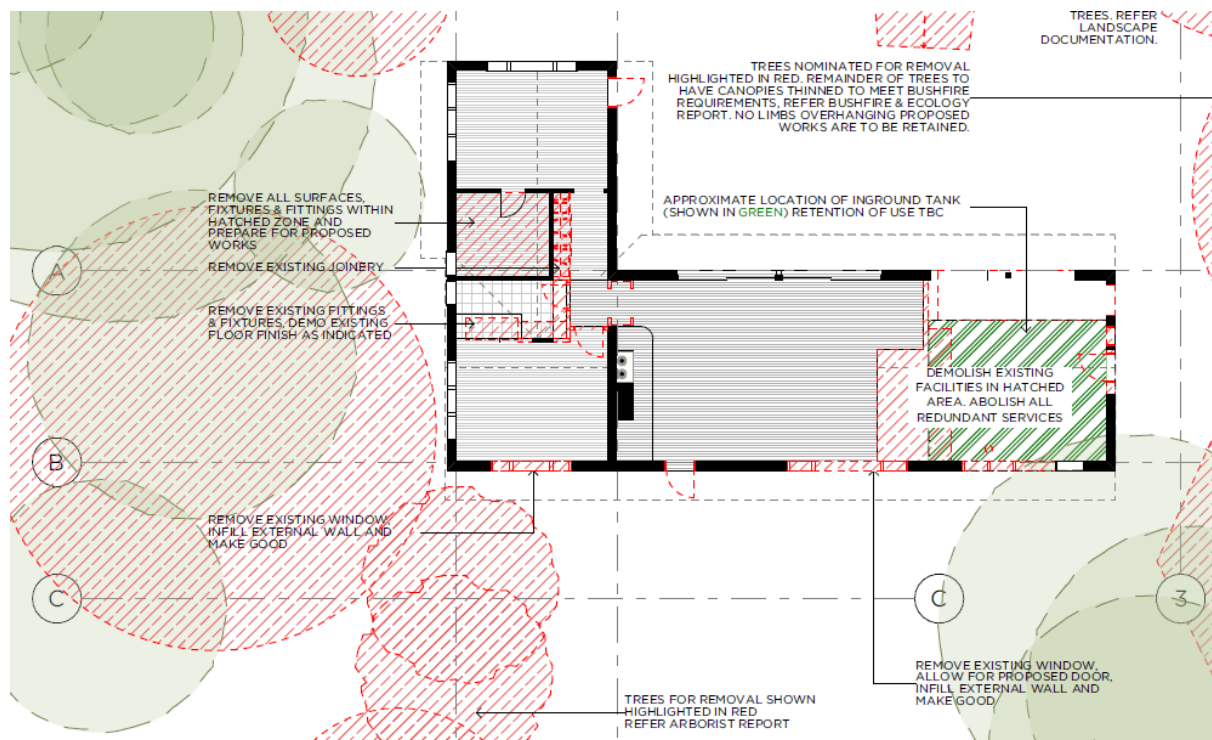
Proposed 'Community 1' Demolition Plan
